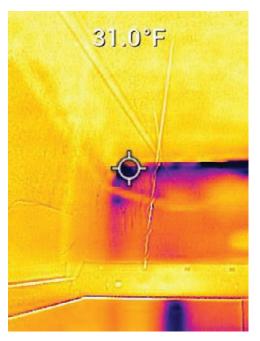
Interior ceiling plenum at SE lower Entry – cold infiltration along top* of outer wall.
